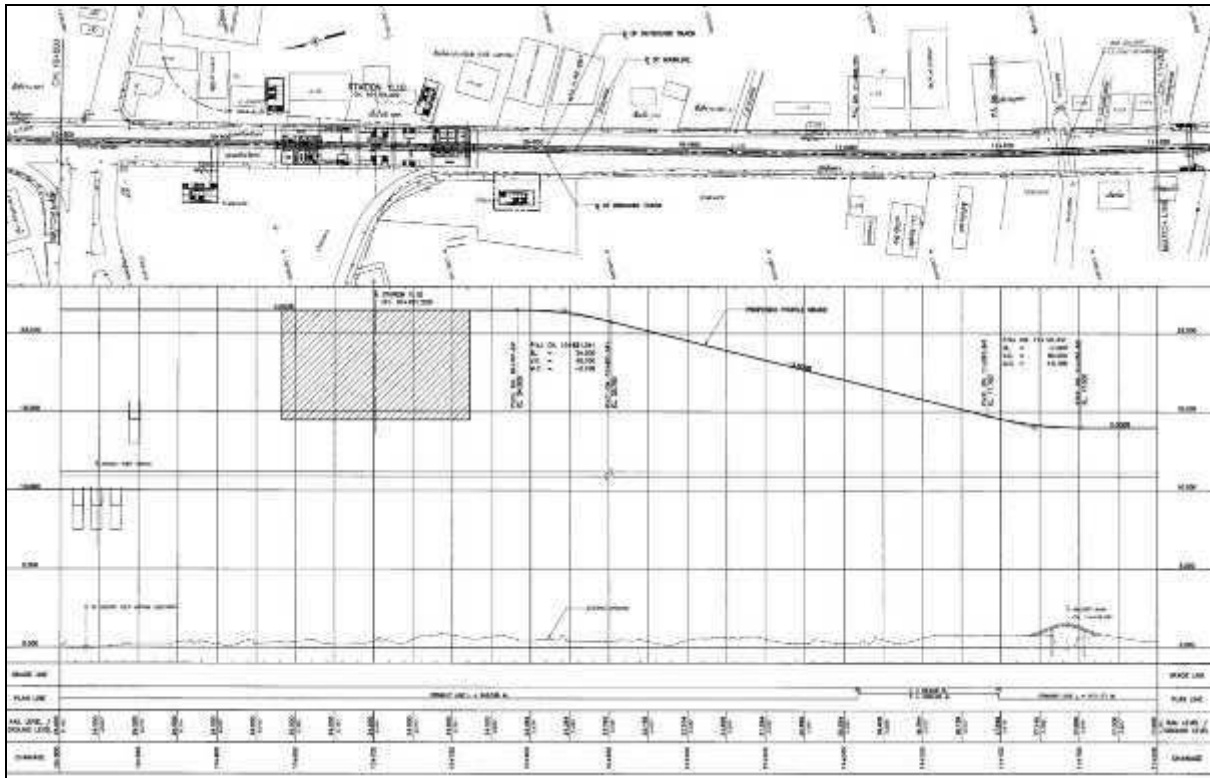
15 Plan and cross section of guide way at Krungthep Kritha Interchange
